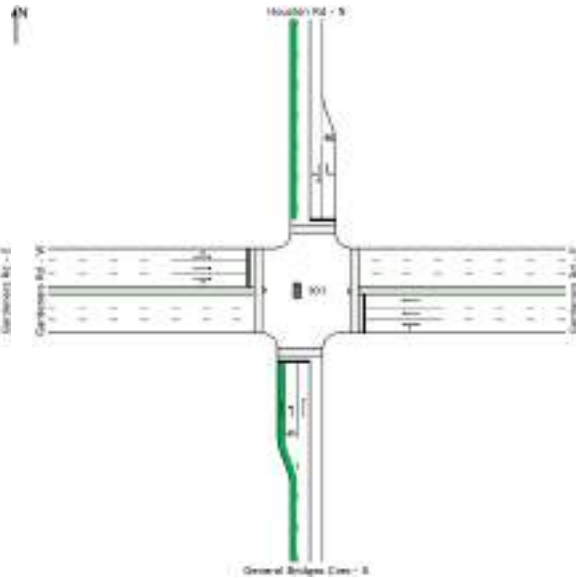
Proposed Houston Road/ Gardeners Road/ General Bridges Crescent Parade layout
